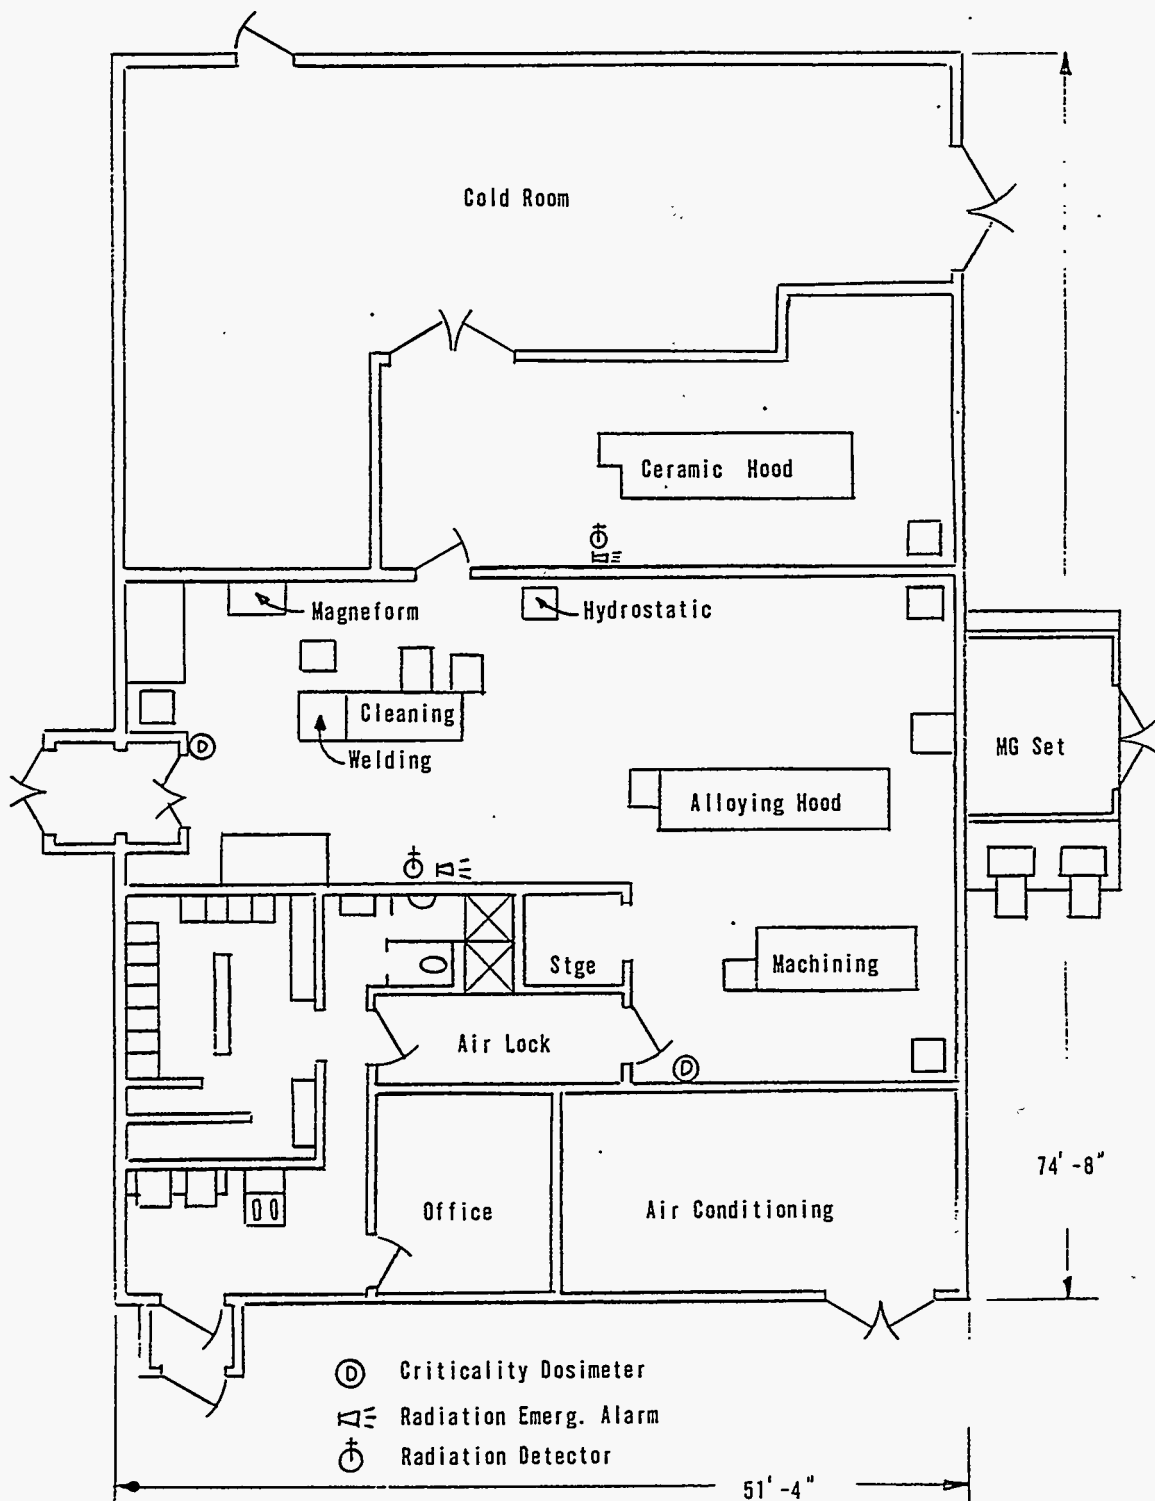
Transuranium Pilot Plant - Floor Plan (Bldg. 3708)
